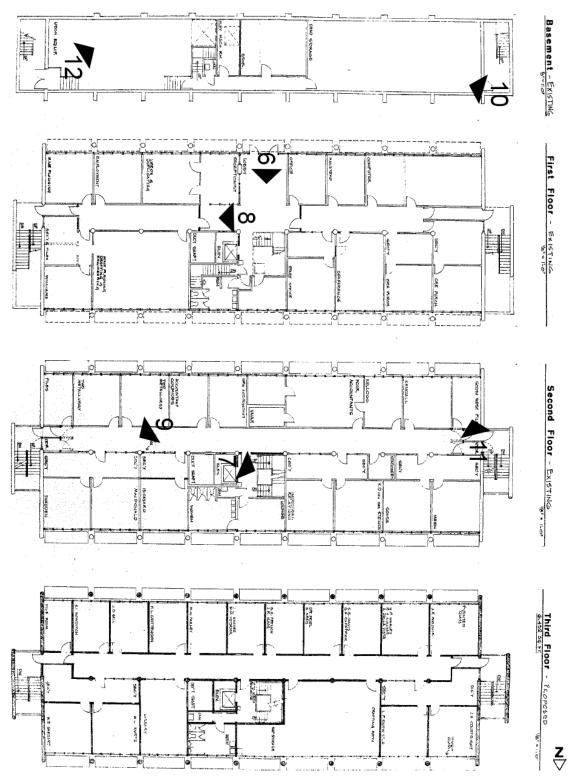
Photo sketch floor plans. Note that final construction of third story plan was different than shown here. (CNWC with additions by the author. Courtesy of the Fenton Investment Company, Inc.)
